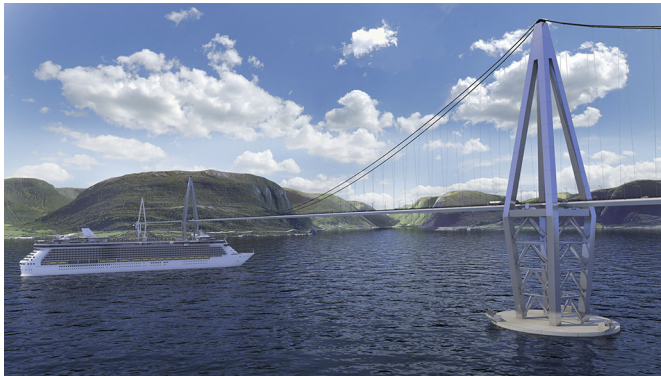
Suspension bridge with floating towers, conceptual illustration (NPRA).
